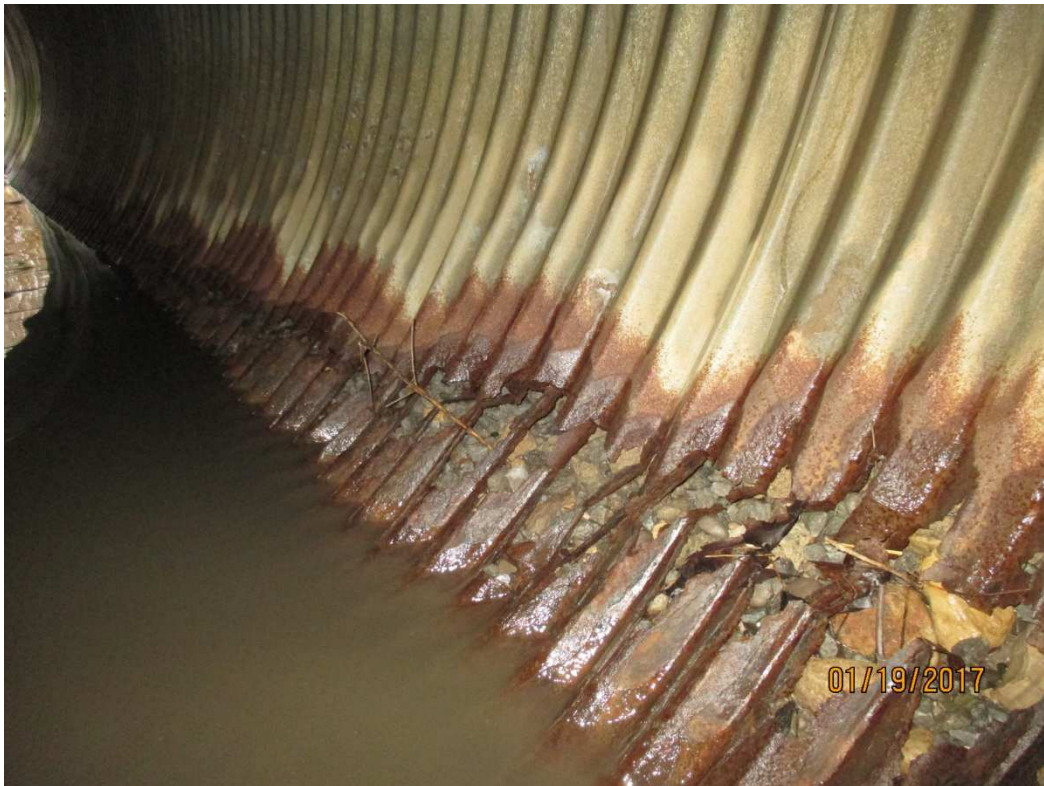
Corrosion with Critical Perforations & Section Loss – East Side of Section 4 of East Culvert Pipe
